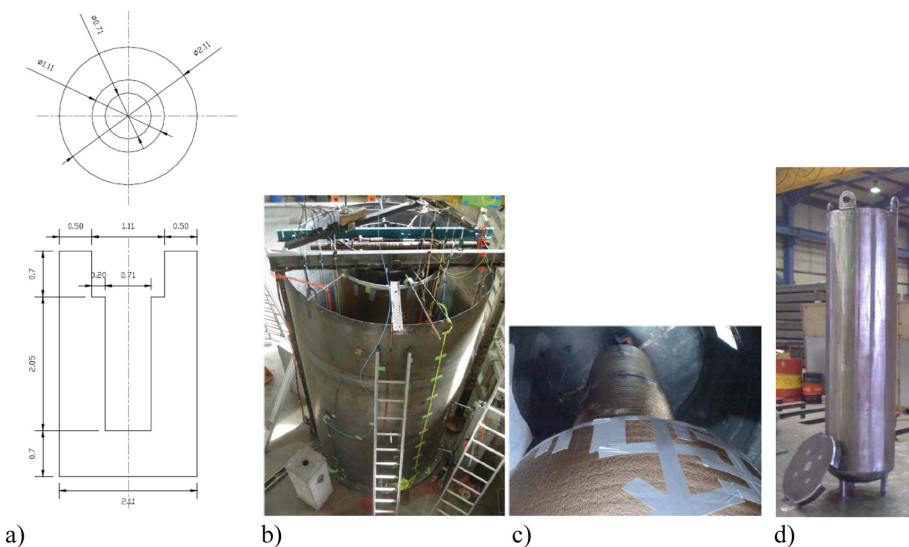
(a) Cross-section of the buffer, dimensions in [m], (b) General view on mould during installation, (c) View of inside of formwork, (d) Carbon steel overpack containing heat source.
